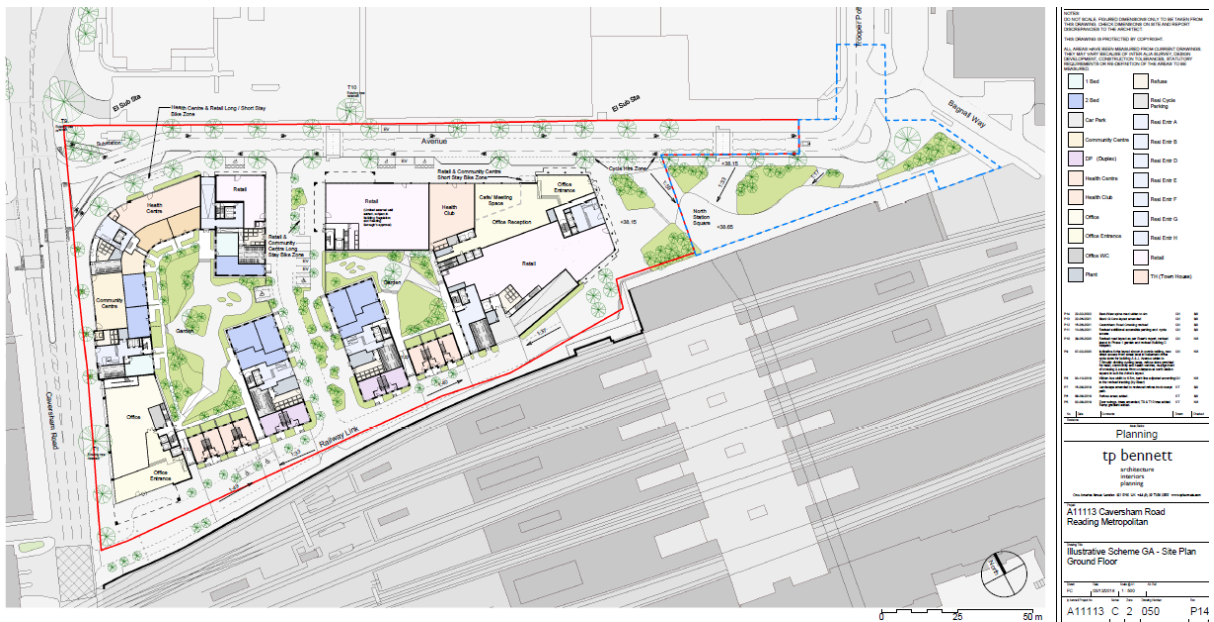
A11113 C 2 050 Rev P14 - Illustrative Scheme GA - Site Plan Ground Floor, as received 22/02/2022
